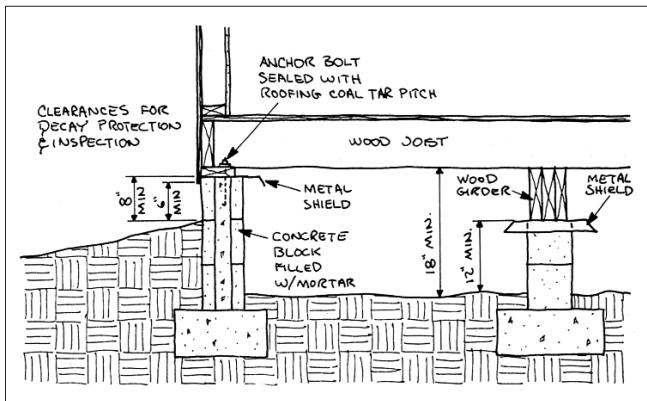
In crawl spaces, if wood joists are closer than 18 inches to exposed ground, the floor assembly, posts, girders, joists, and subfloor should be naturally durable or pressure-treated wood.
